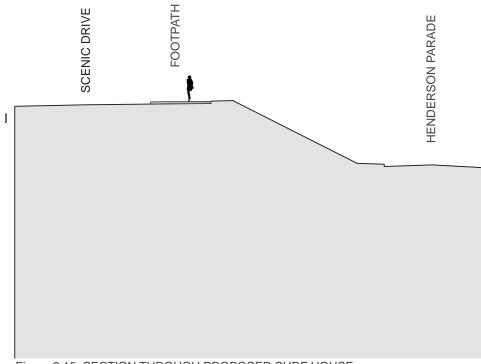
SECTION THROUGH PROPOSED SURF HOUSE
